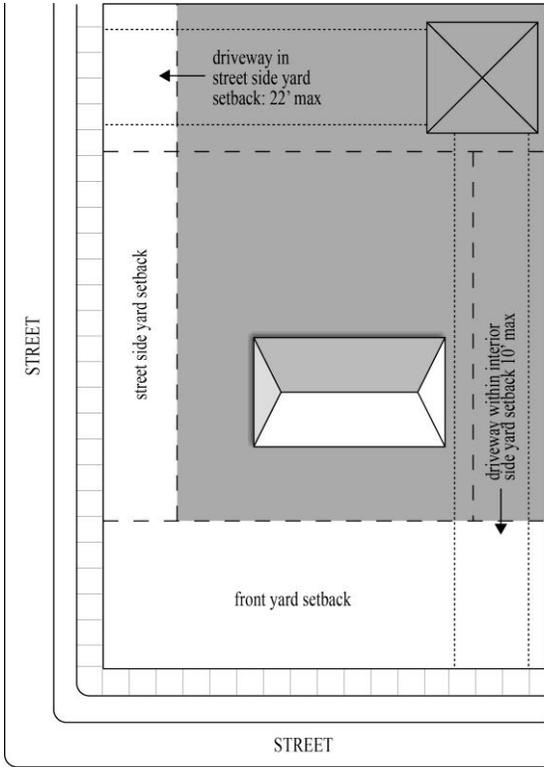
Interior and Street Side Yard Driveway Example: Detached Garage
